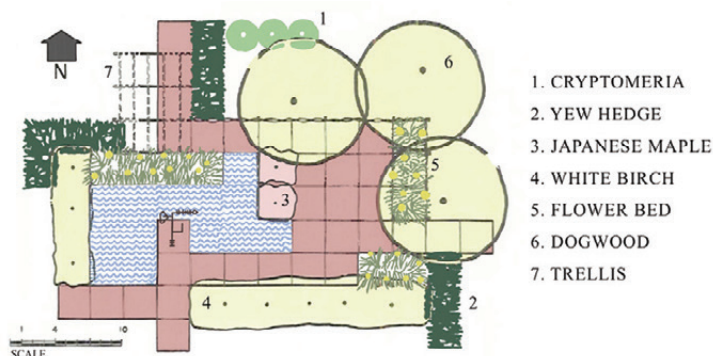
| Plan of the Pool Garden (credit: M. Zadeli, 2023).
